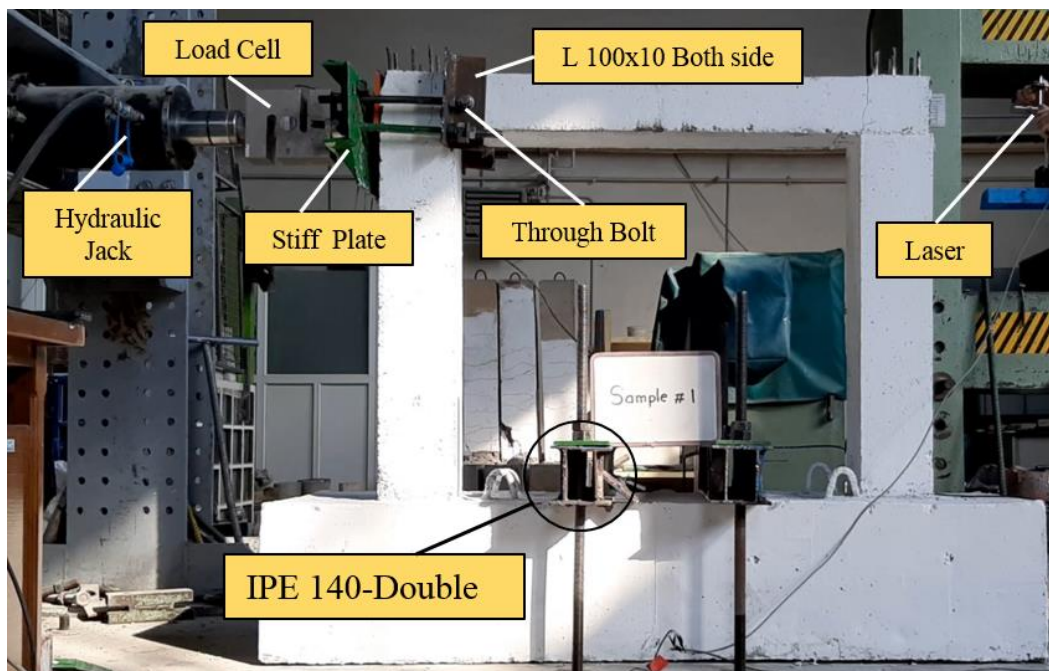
Geometric view of the concrete moment-resisting frame and placing manner of the brace and the F-3-ADAS yielding damper
